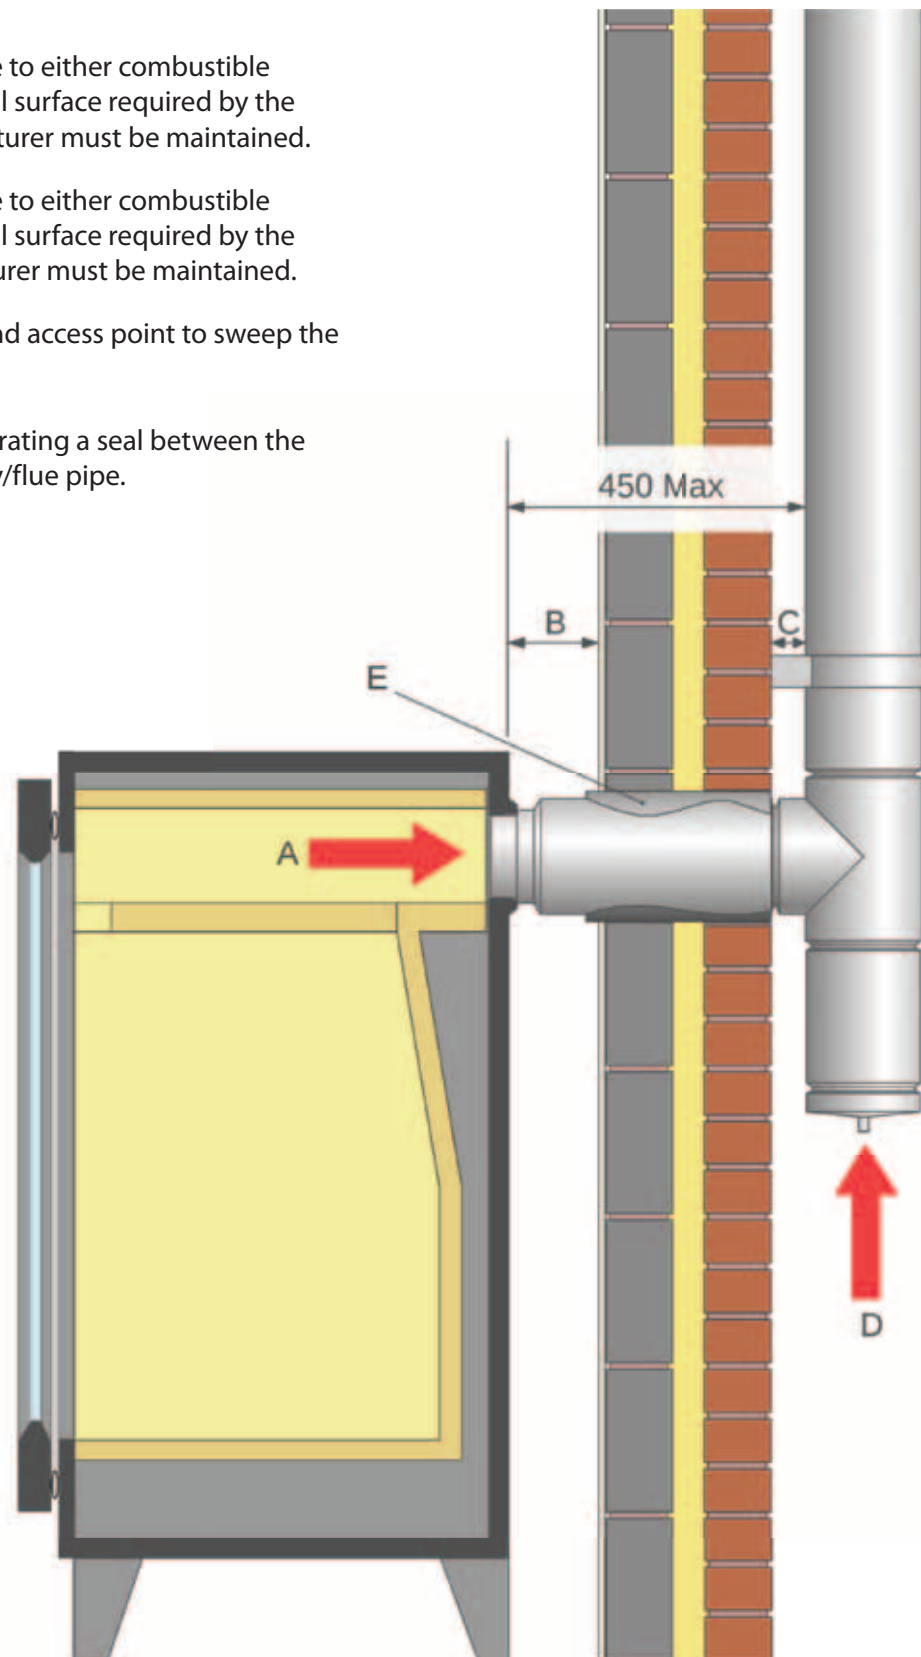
Typical installation using an appliance with a horizontal rear flue outlet to an external system chimney
